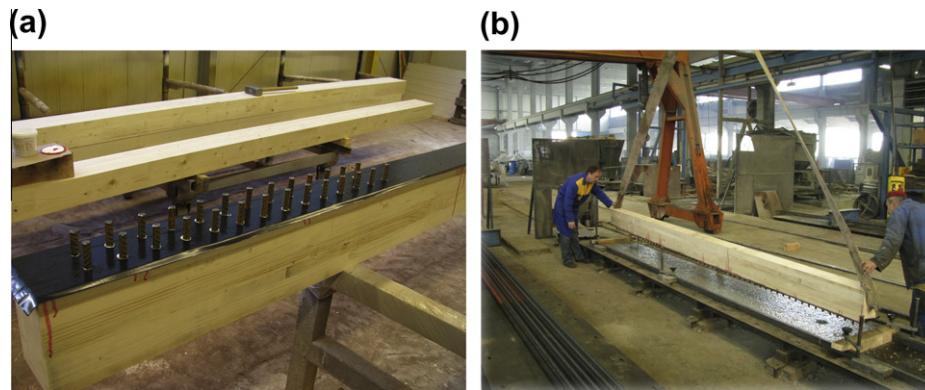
(a) Installation of the steel dowels onto the timber beam. (b) Laying of the timber beam onto the concrete slab.
